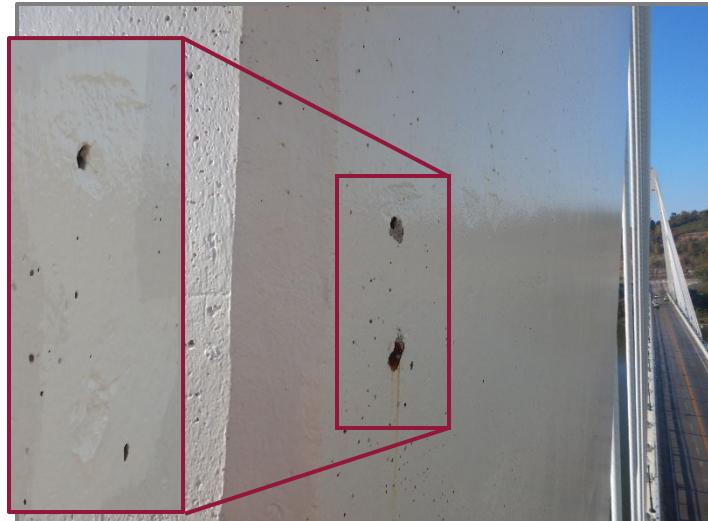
Tower 4 west face with two small areas of sealant failure with the top one around a void (looking south) and after areas were sealed (inset).
